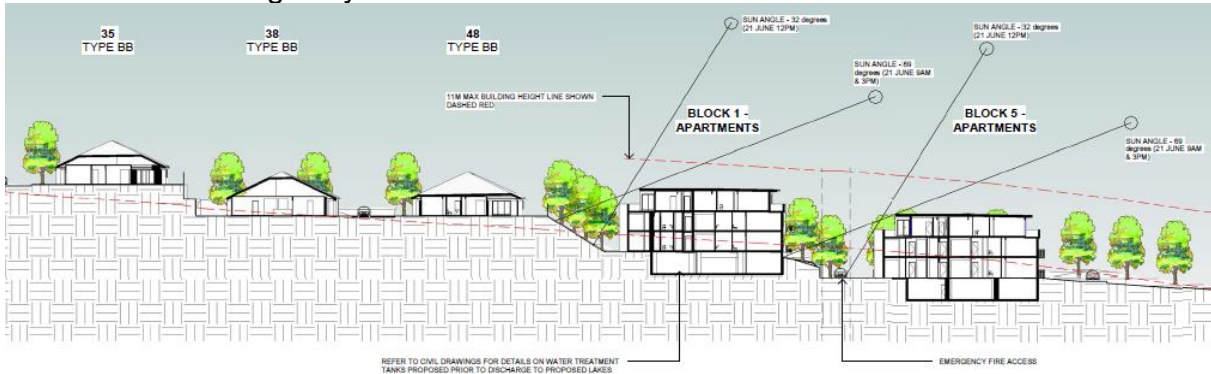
Part Site Section BB showing 11m maximum building height plane (red dashed line)
